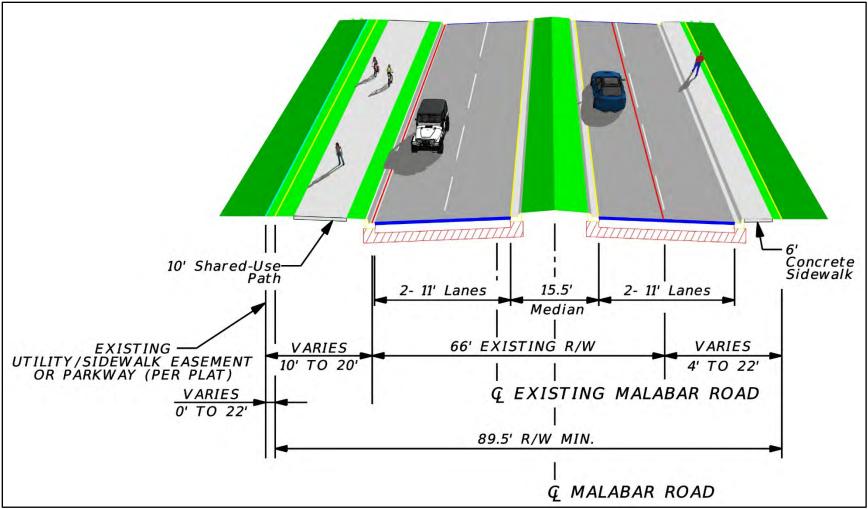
89.5' Alternative A – St. Johns Heritage Parkway to Canal C-10
